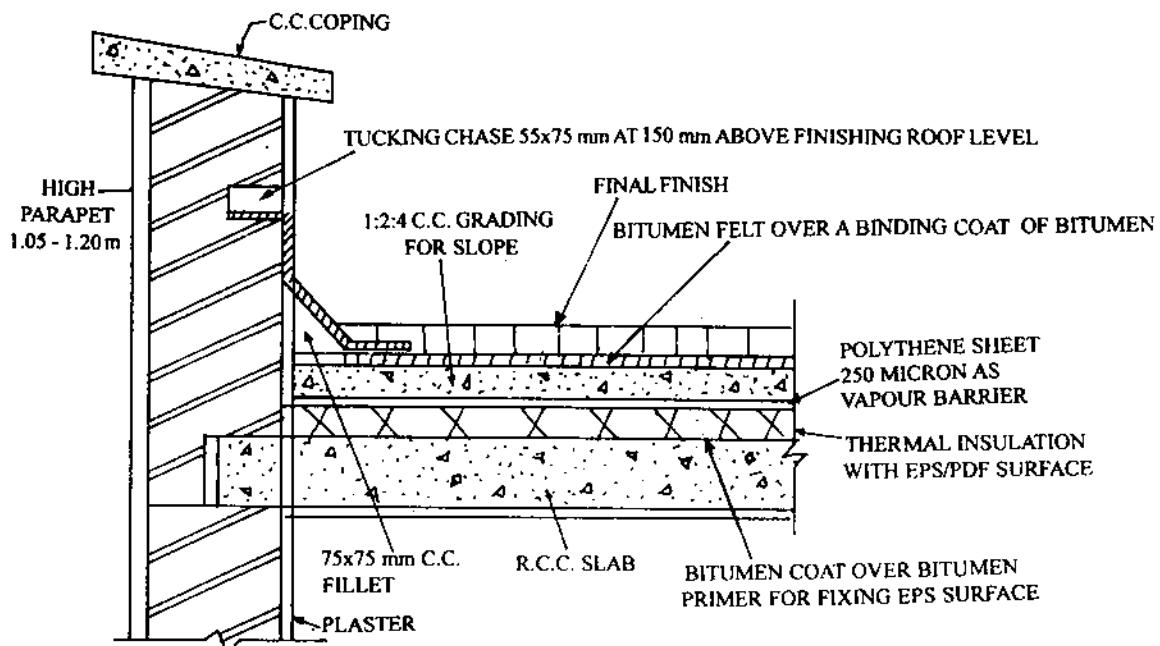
Thermal insulation cum water proofing of flat roofs with bitumen felt
